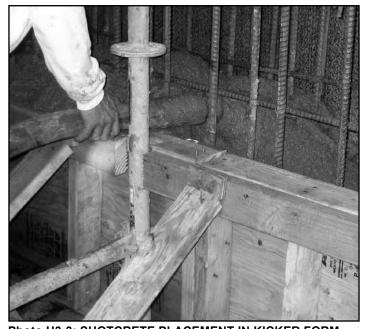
SHOTCRETE PLACEMENT IN KICKER FORM Apply project approved shotcrete mix without air velocity into minimum 24" (600 mm) high kicker form and then consolidate by vibration.
